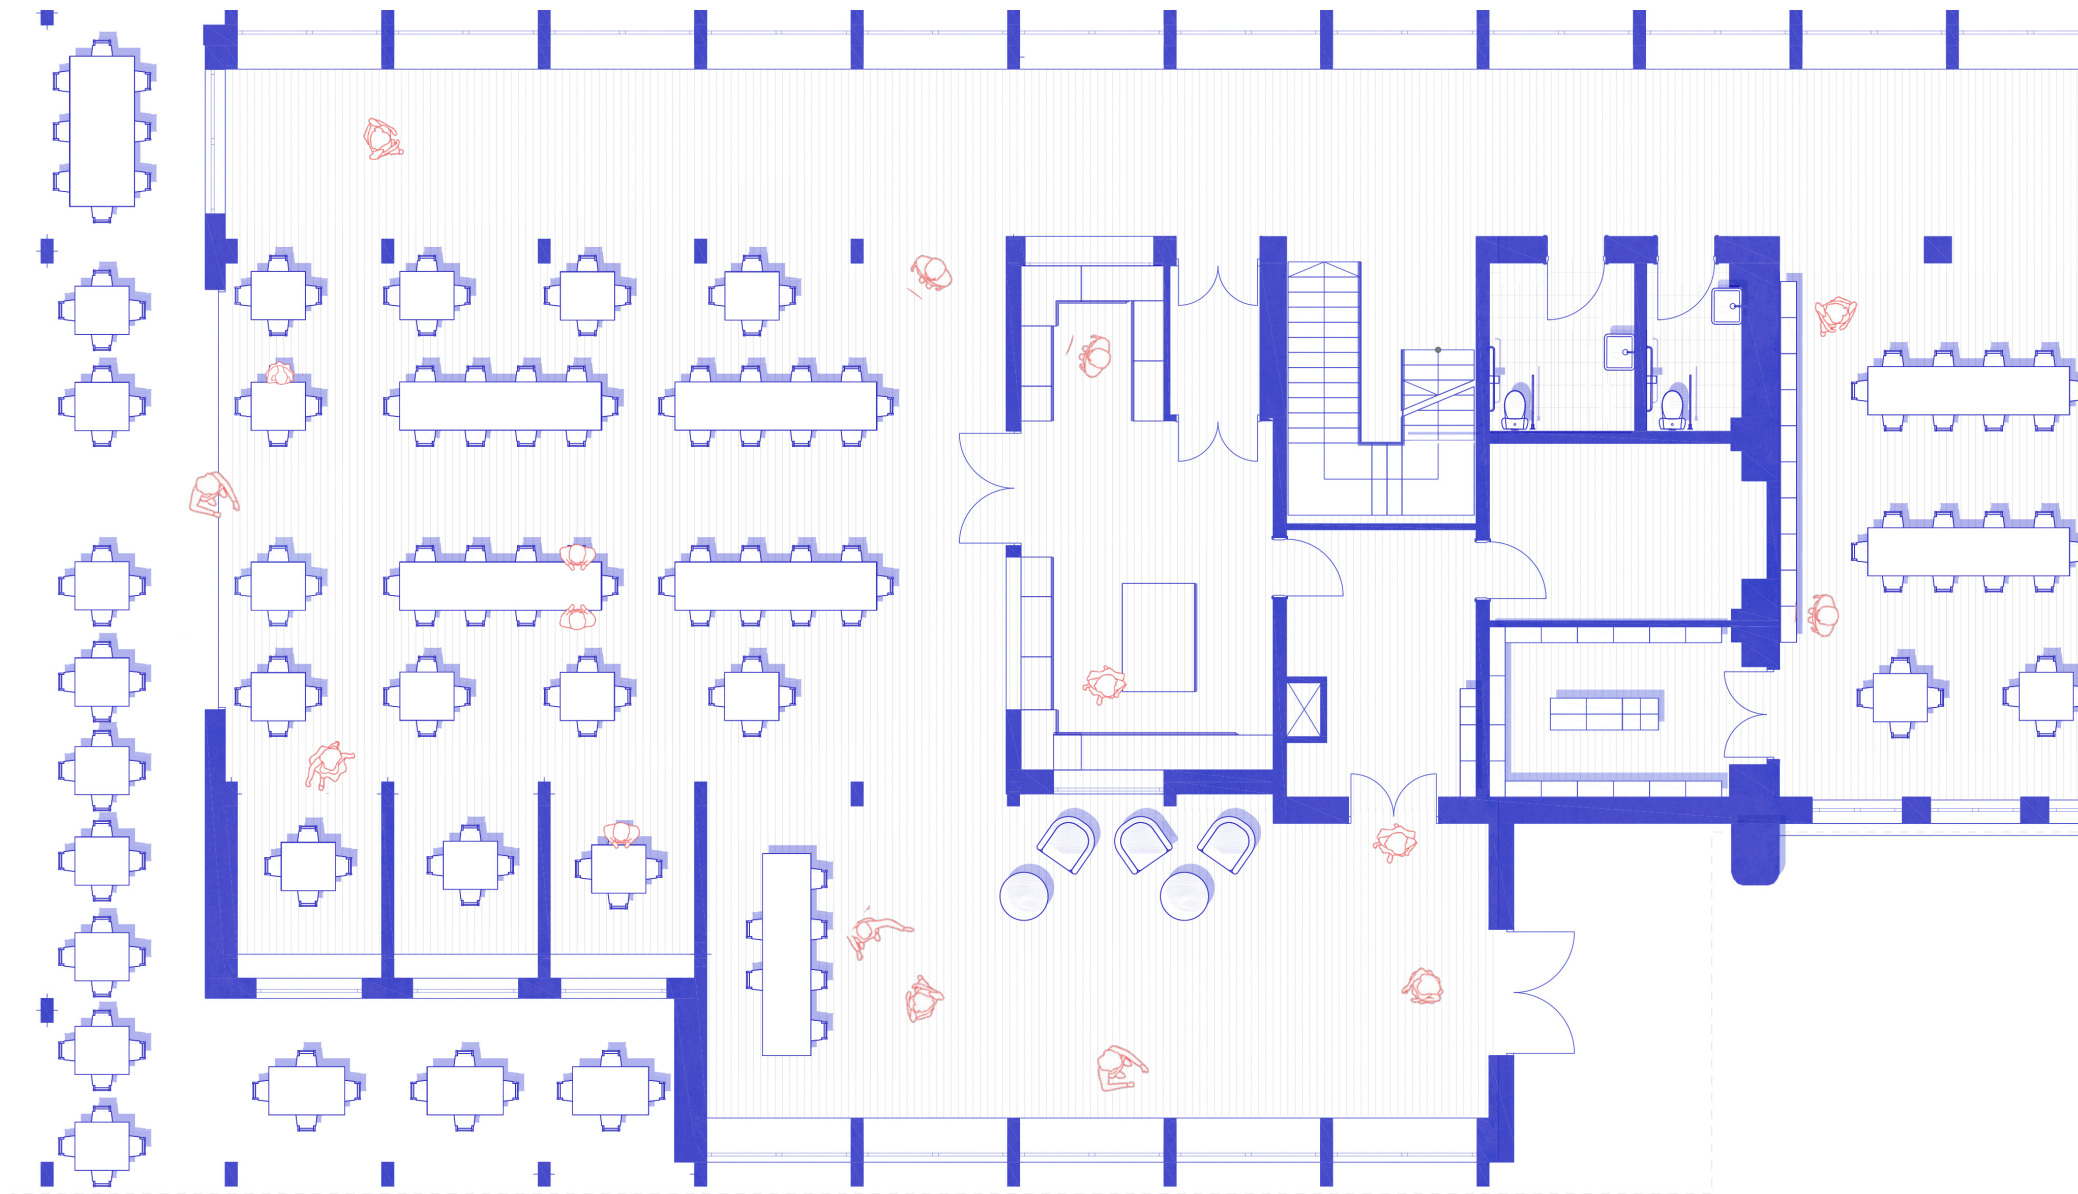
Community center, zoomed-in plan and design concepts (Ground floor)
